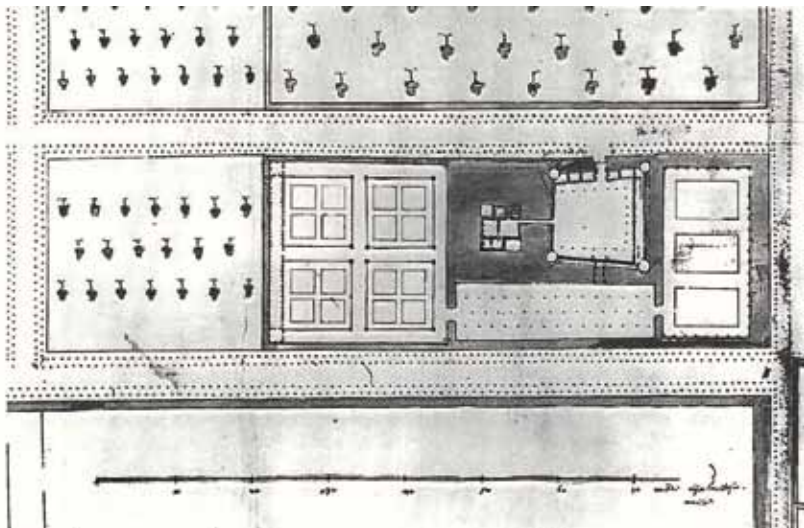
Plan of Zuylestein showing the sixteenth-century layout in 1630, shortly before the first expansion
